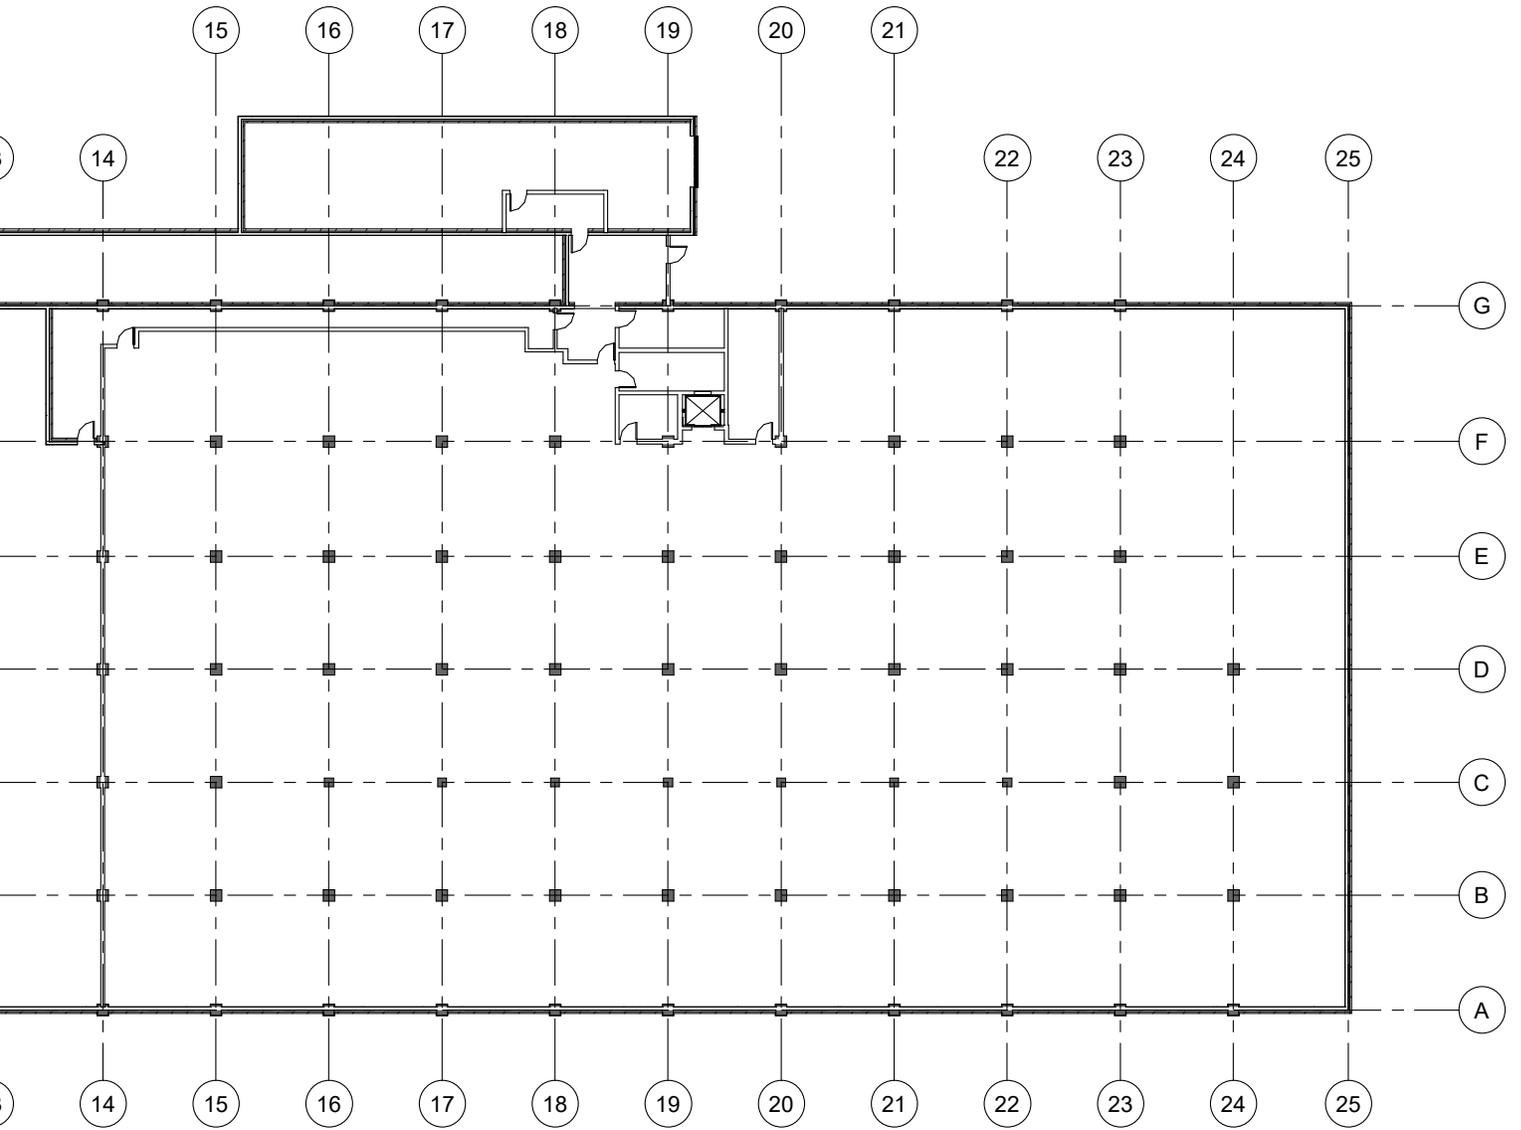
Stantec Architecture Ltd. (2013). Level 1 - Floor Plan [AutoCAD Drawing]. Floor plan was retrieved from Stantec Architecture in
